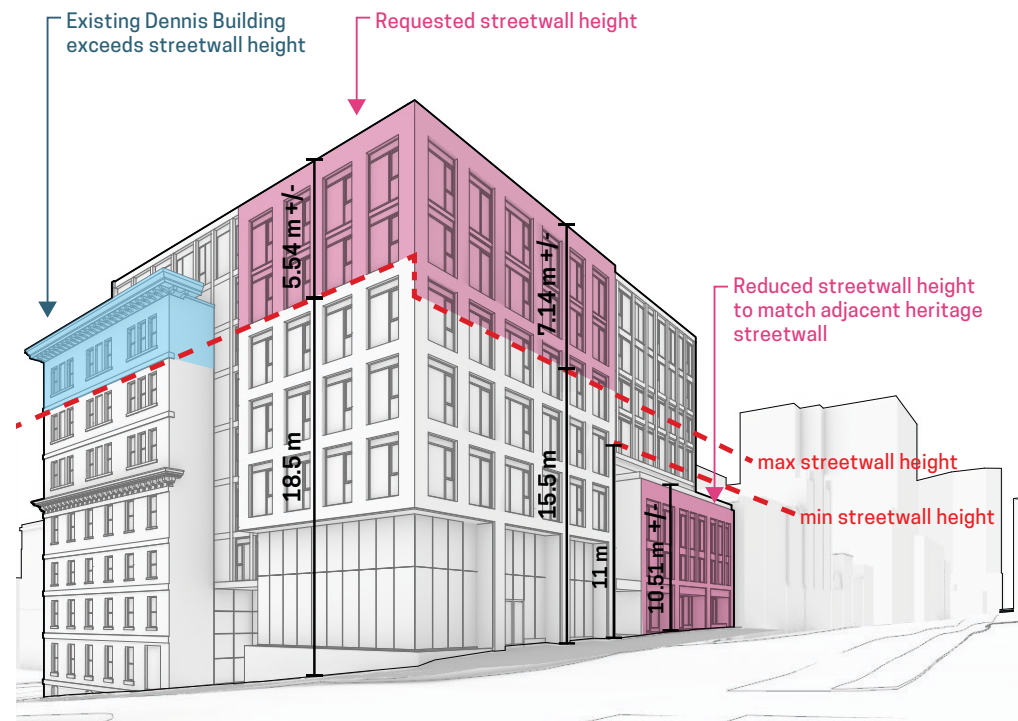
a Streetwall Height: Building massing with requested streetwall height variance. Heights are to top of slab, parapet heights and details to be determined in final design.
